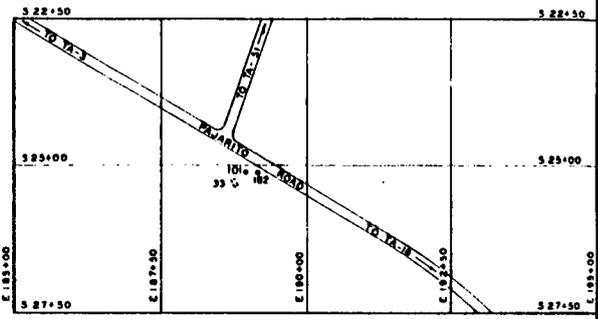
Structure Location Plan for TA-18 - Pajarito Site (1957 Drawing from the LANL Technical Area Structure Location Plans)
